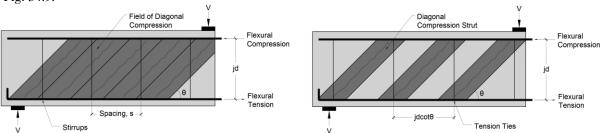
Diagonal stress fields in a cracked reinforced concrete beam (left) and Simplified truss model for concrete members subjected to shear (right)
